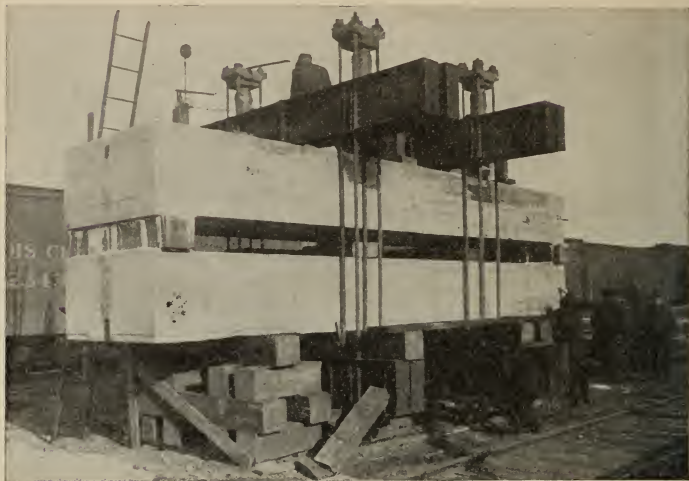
VIEW SHOWING SLABS AND TESTING APPARATUS IN PLACE.
